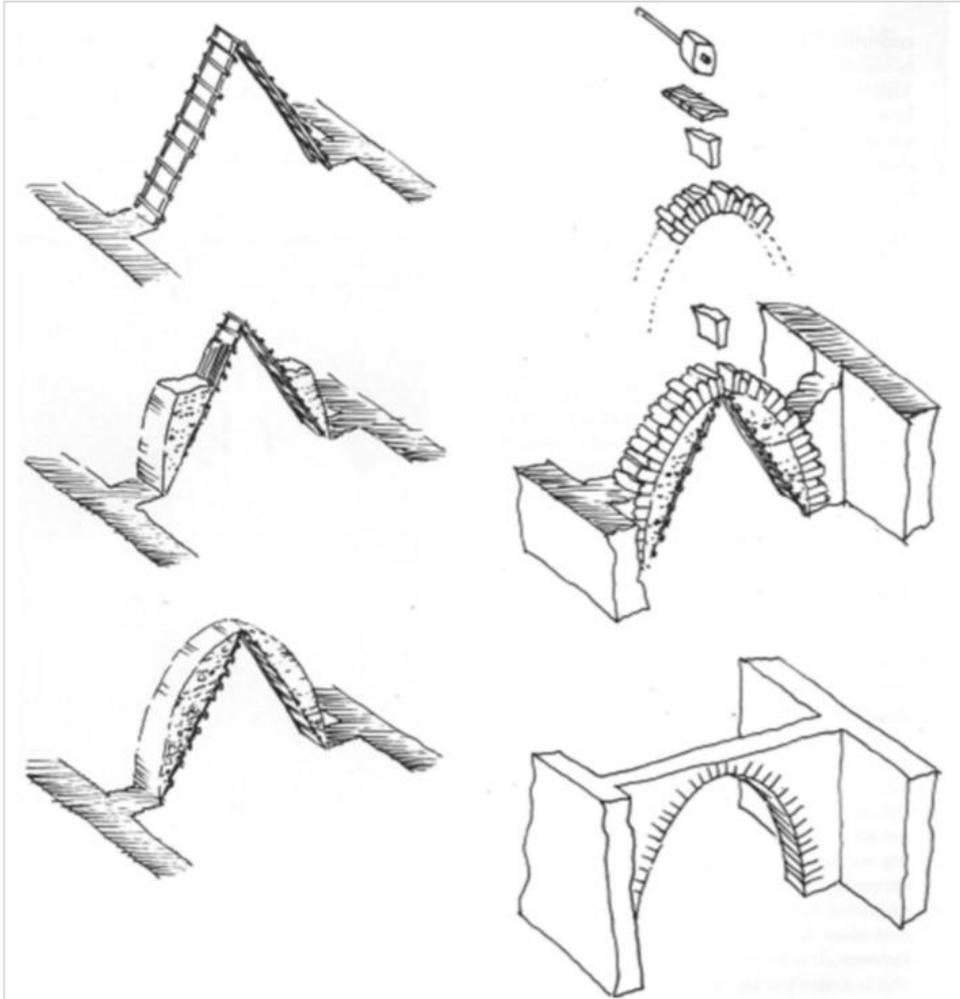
Traditional method of constructing arches in Jordan (Khammash 1995, p. 78)
